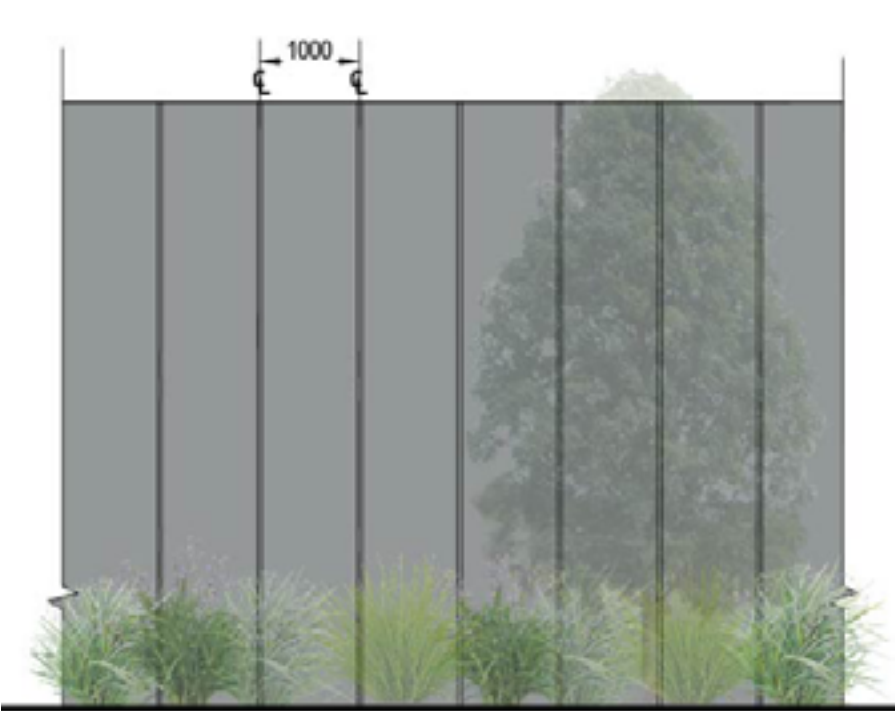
Vertical rebate - Typical elevation - In-situ wall
